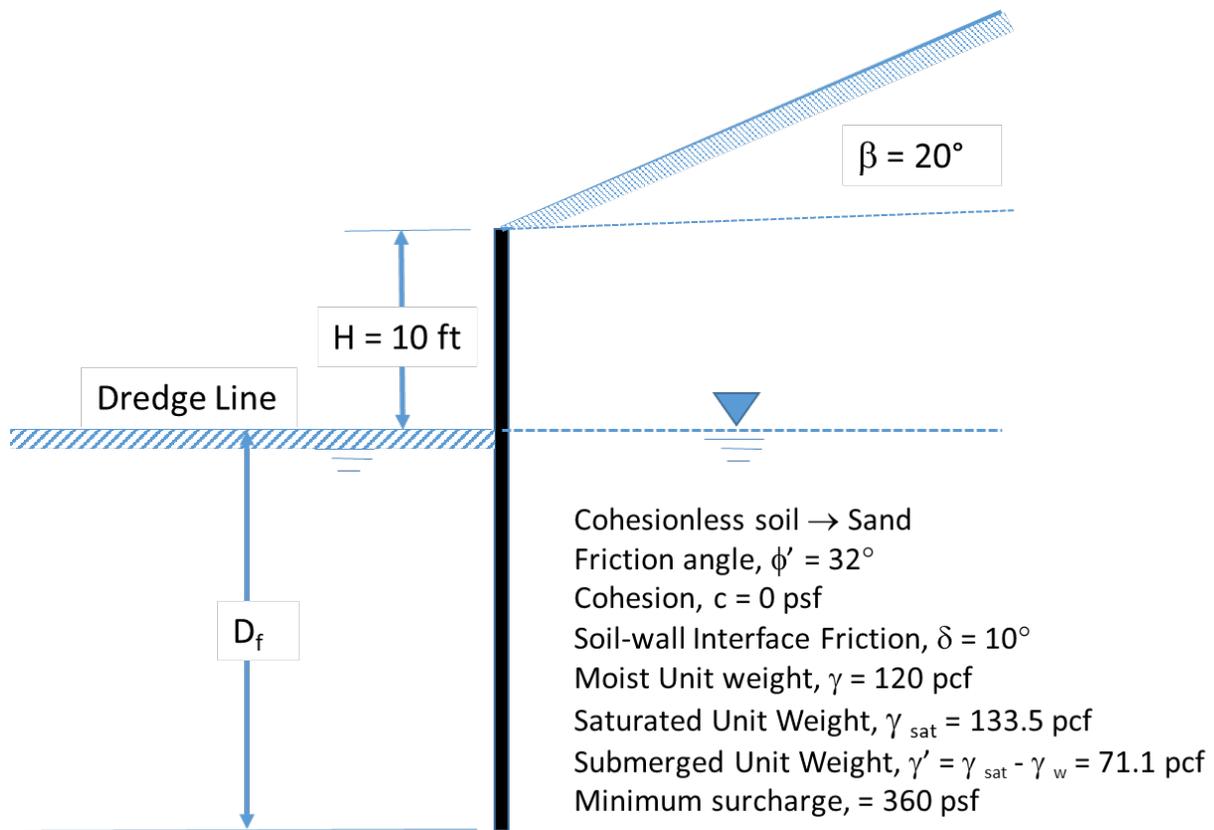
Case 2 Cantilevered TERS in cohesionless soil with sloped backfill.
